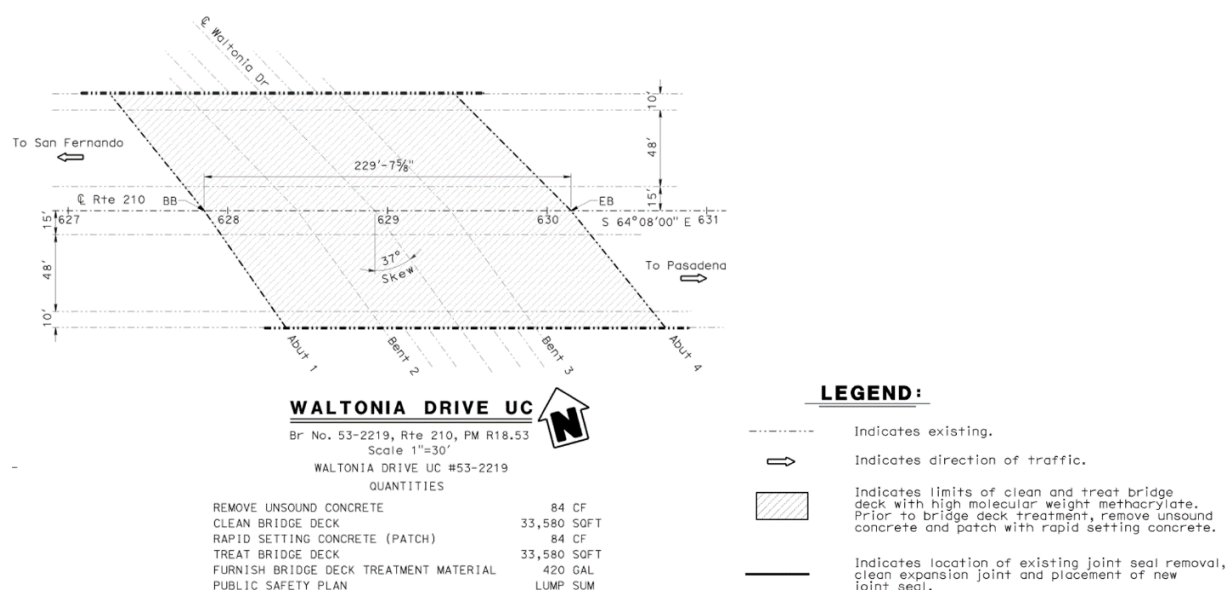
Sample Plan with Spall Repair and Methacrylate Resin Treatment for a Bridge Deck
